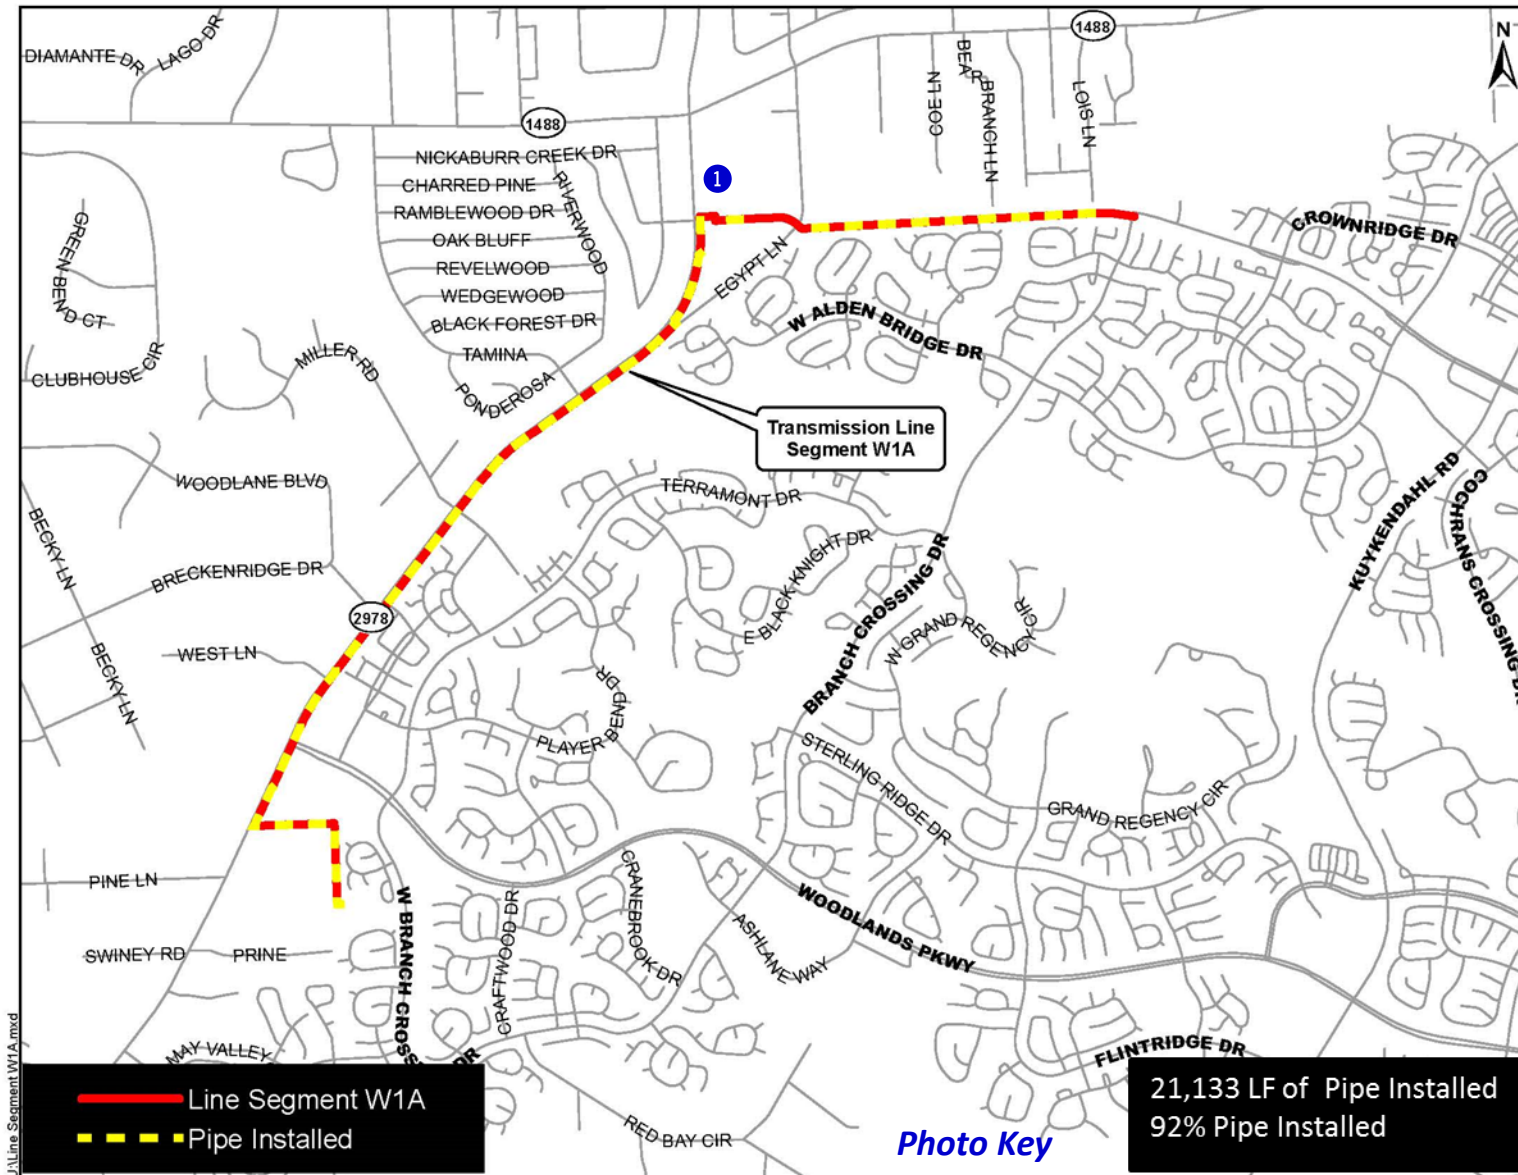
(con't) Transmission Line System Construction Photos
